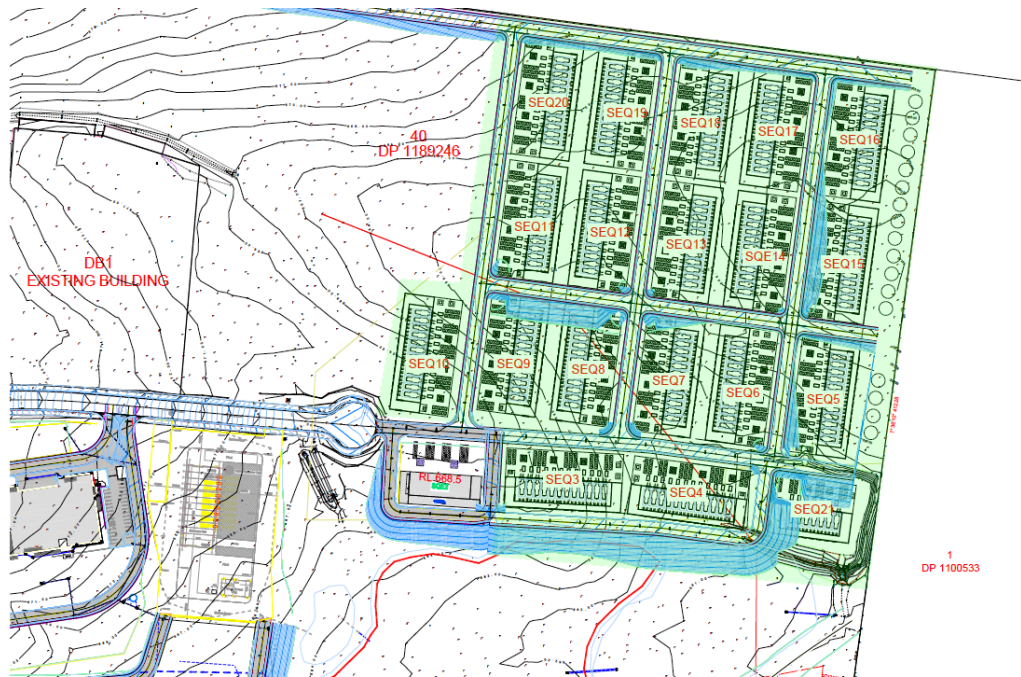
General Arrangement Plan. Source: Lucas Consulting Engineers
